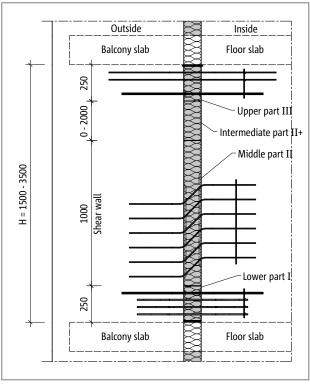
Schöck Isokorb® XT type W: Plan view; balcony construction with thermally insulated load-bearing shear walls
